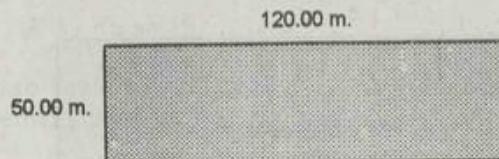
FLOOR PLAN OF PARKING AREA
